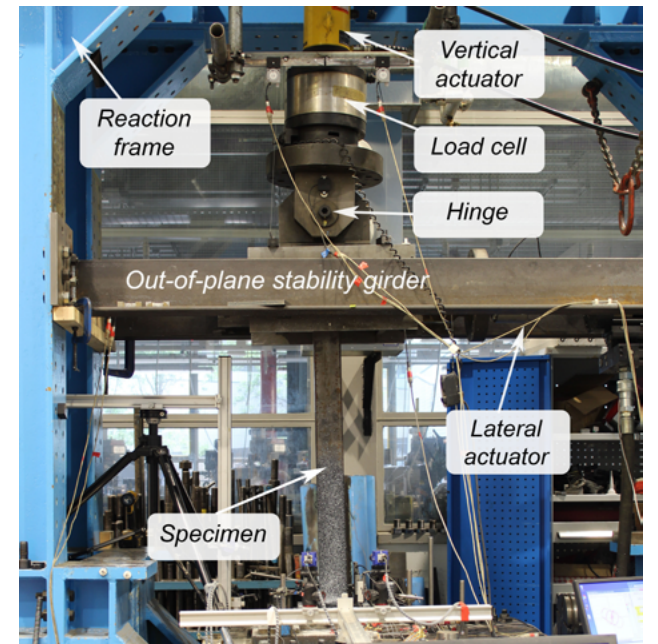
Lateral cyclic test setup of steel tubes infilled with RuAAC.
